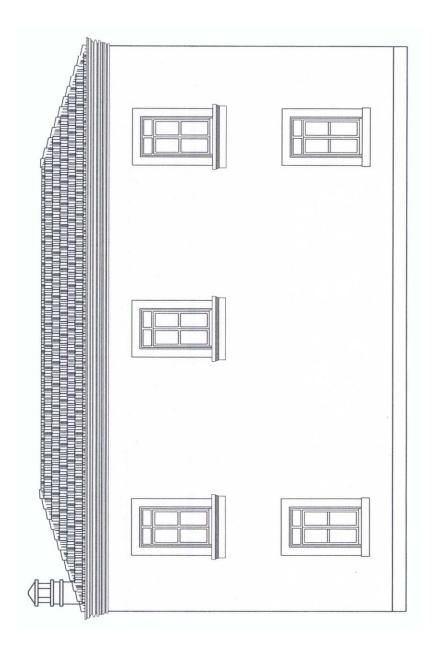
Right Elevation of 1-Artemis Street Scale: 1/75
